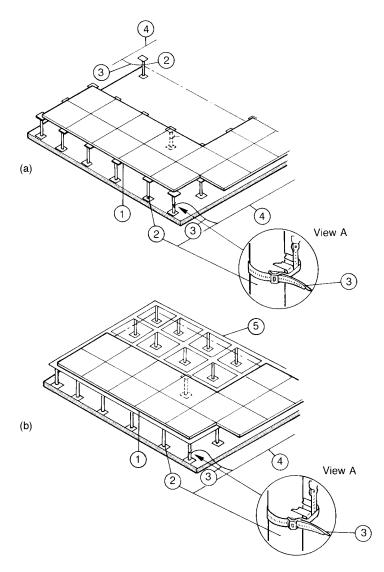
(a): Typical stringerless screen floor construction. (b): Typical stringer screen floor construction. (Key: 1, screen floor tiles; 2, mounting pillars; 3, earth connection wire; 4, main earth wire; 5, metal support stringers)
